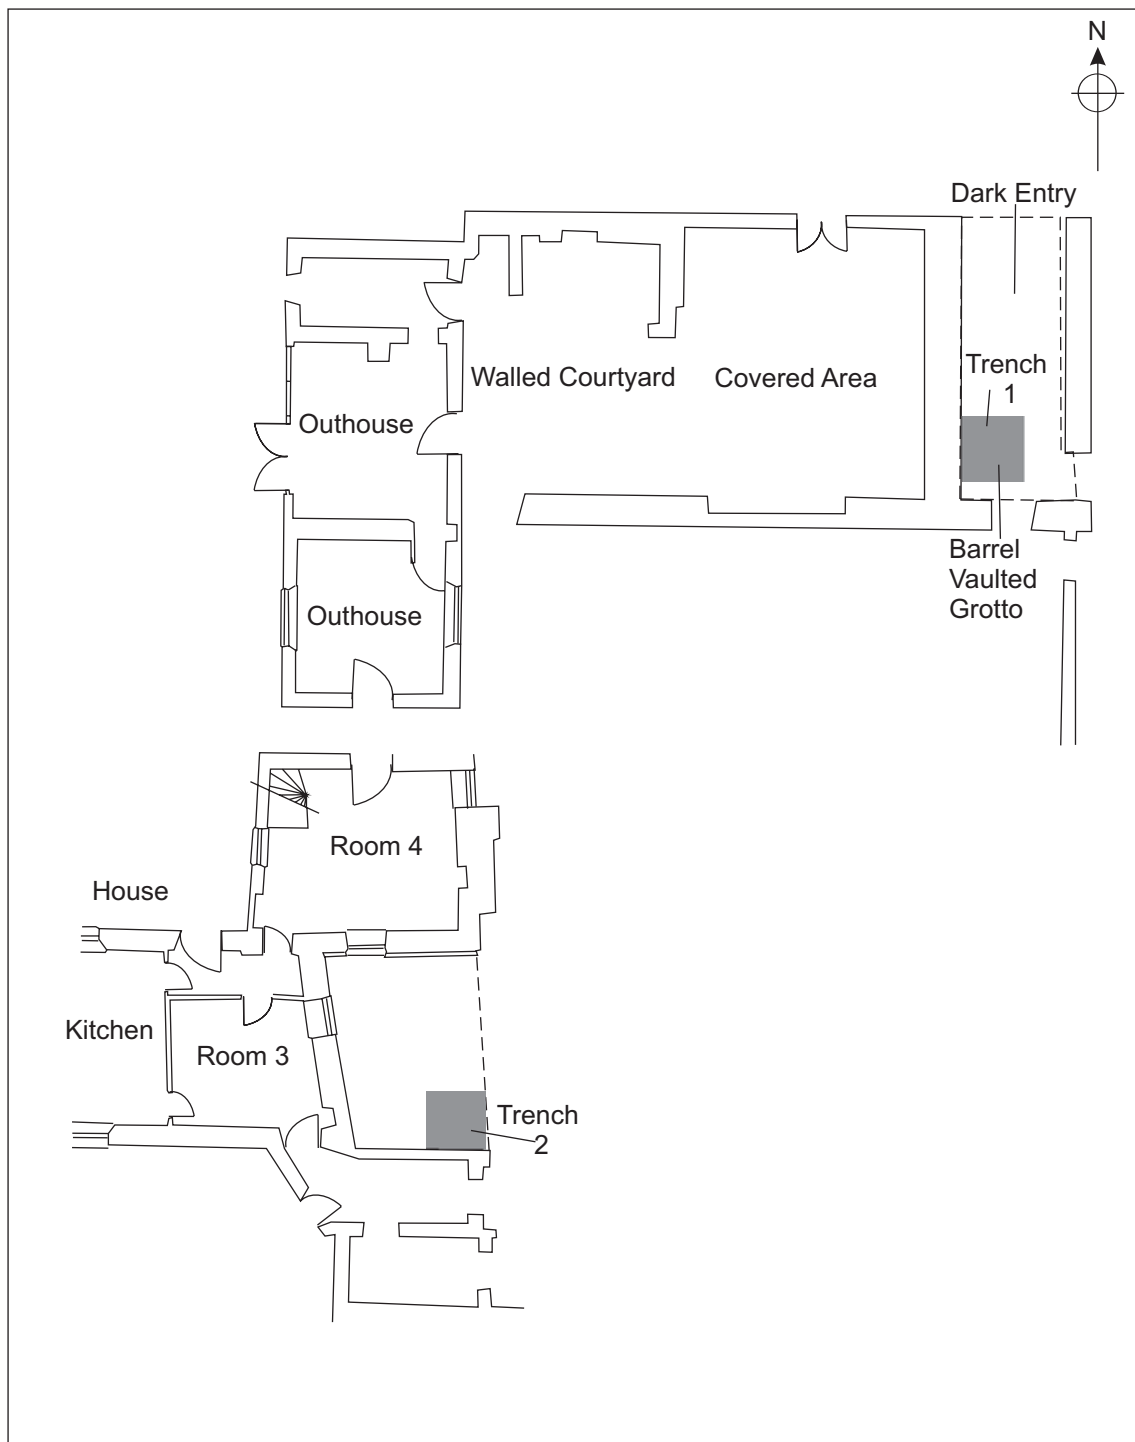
Location of Trenches 1 and 2. Scale 1:200
